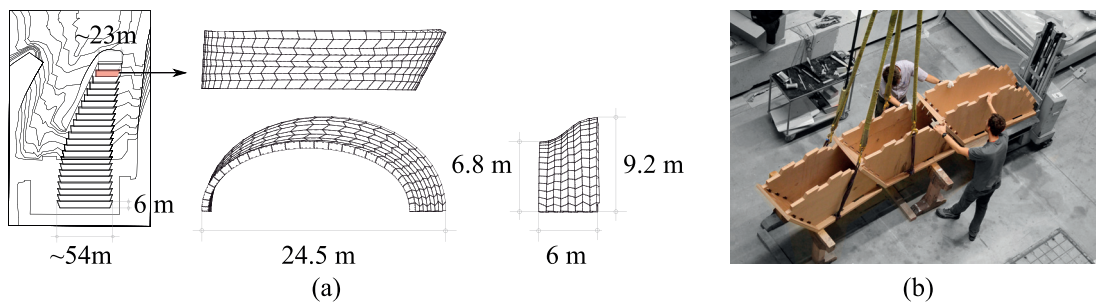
2016 - A double-layered timber plate shell [RKD⁺16] : (a) Full-scale project, (b) Full-scale mockup of 40mm Beech-LVL interconnected boxes.
